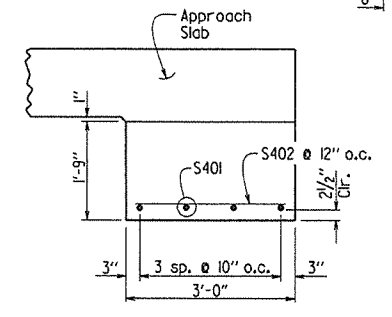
DETAILS OF LONGITUDINAL CONSTRUCTION JOINT
